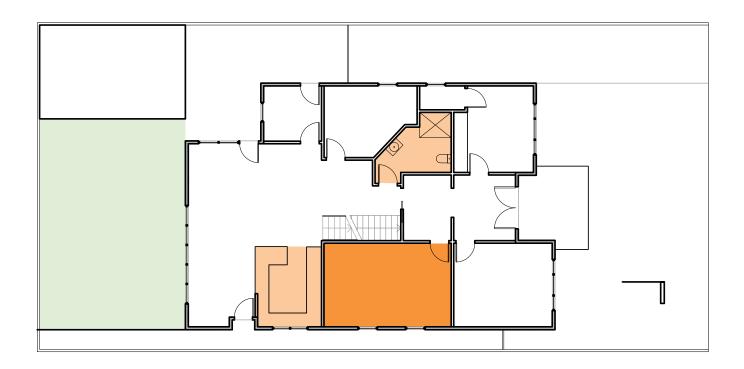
ROOMING HOUSE GROUND FLOOR PLAN
